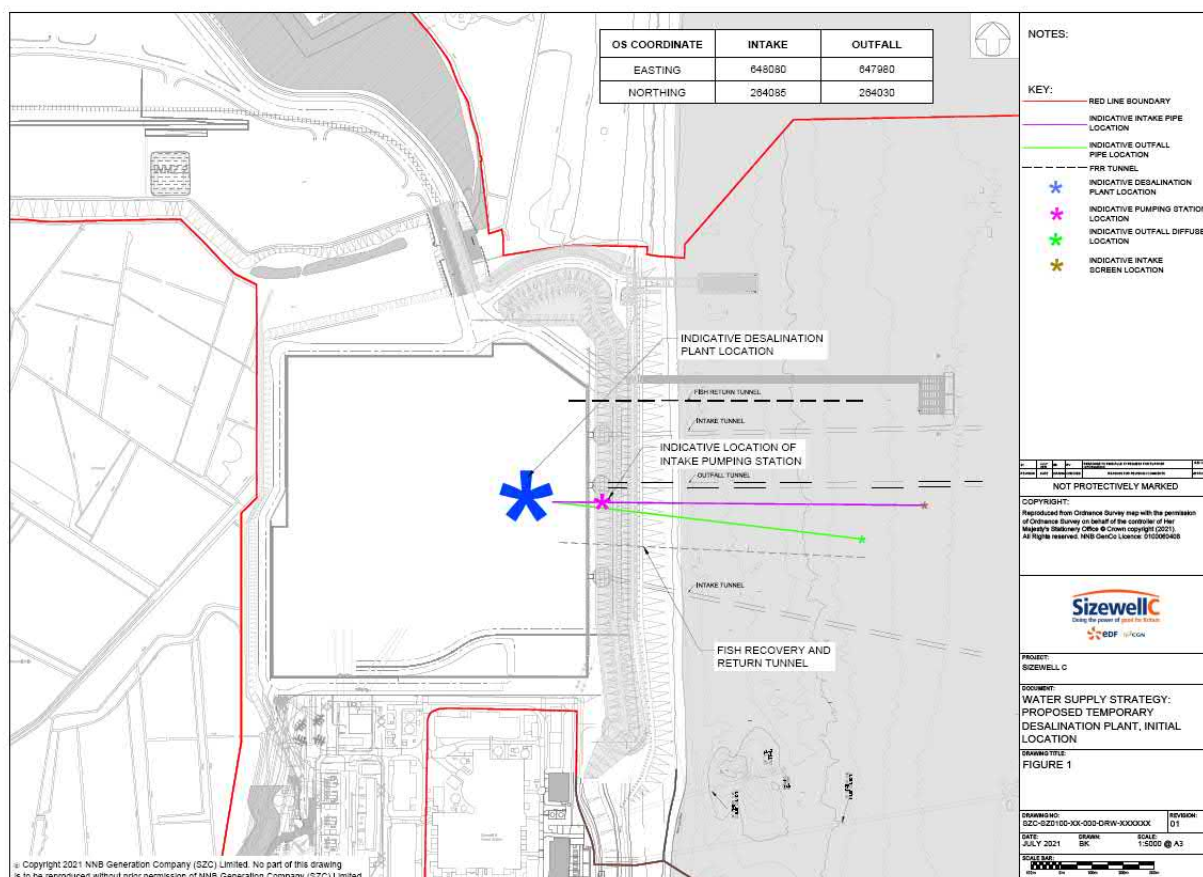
Indicative construction phase desalination intake and outfall plan.
